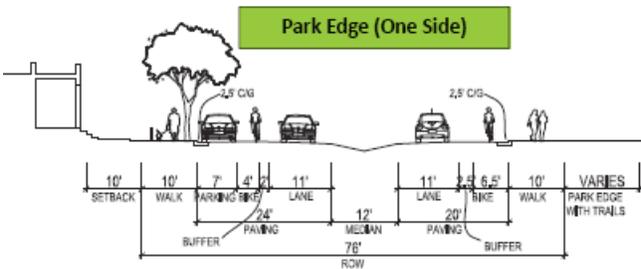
Park Edge Street (Conceptual Cross Sections)
